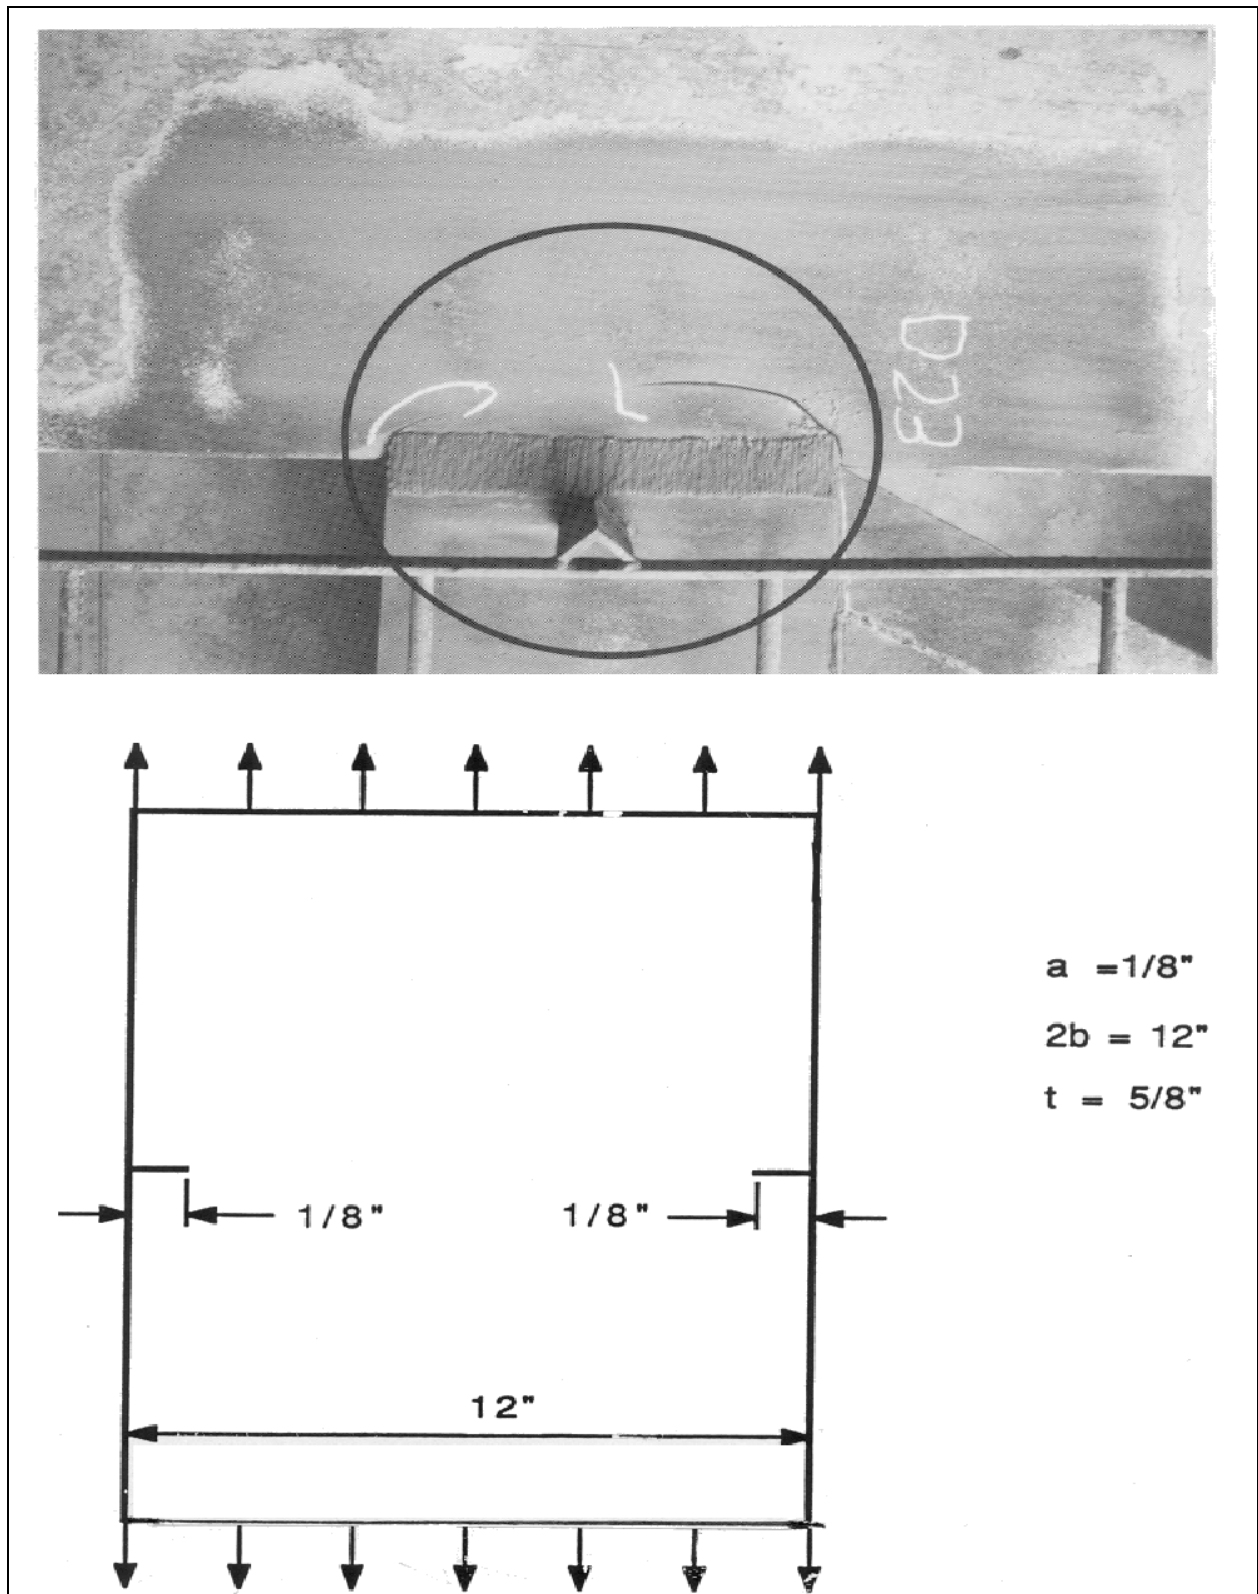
A double-edge cracked flange (1 in. = 2.54 cm)
